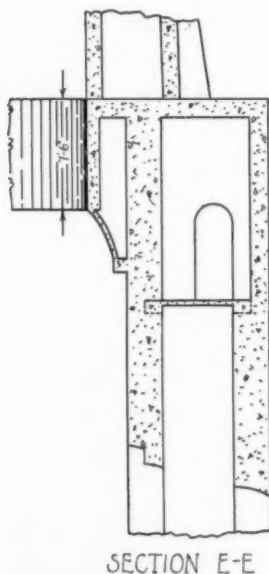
Section on line EE, Fig. 3. At E on key drawing, Fig. 1.
